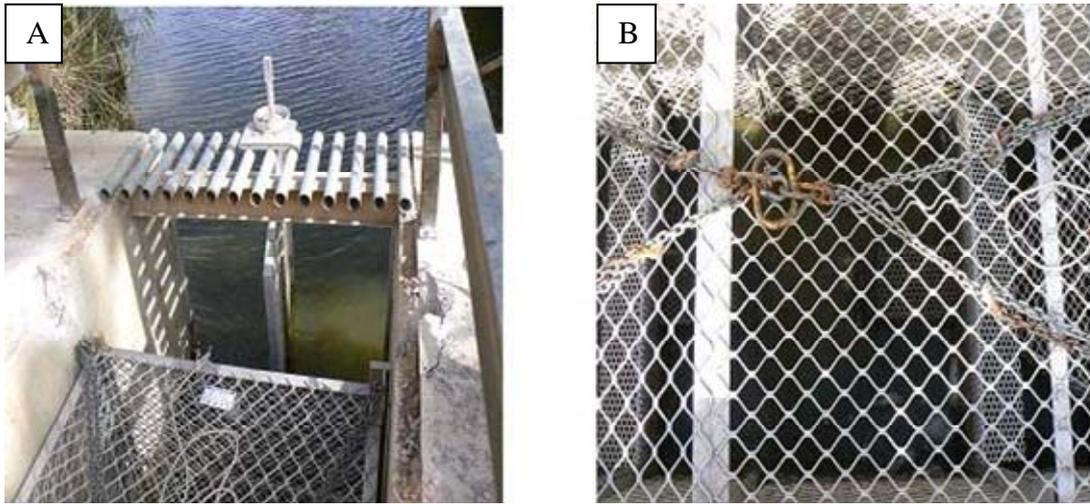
A: Entry point of culvert and B: the central holding area with jumping baffles upstream and downstream.
